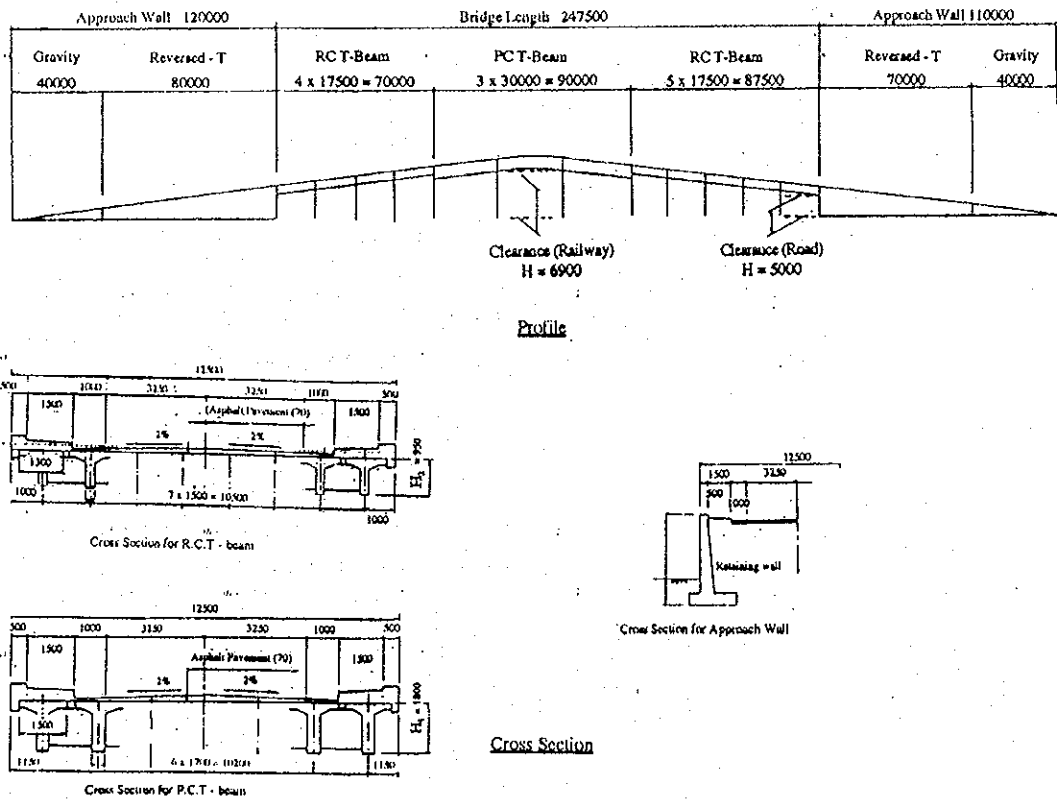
Typical Cross Section and Profile for Bus Terminal F/O
